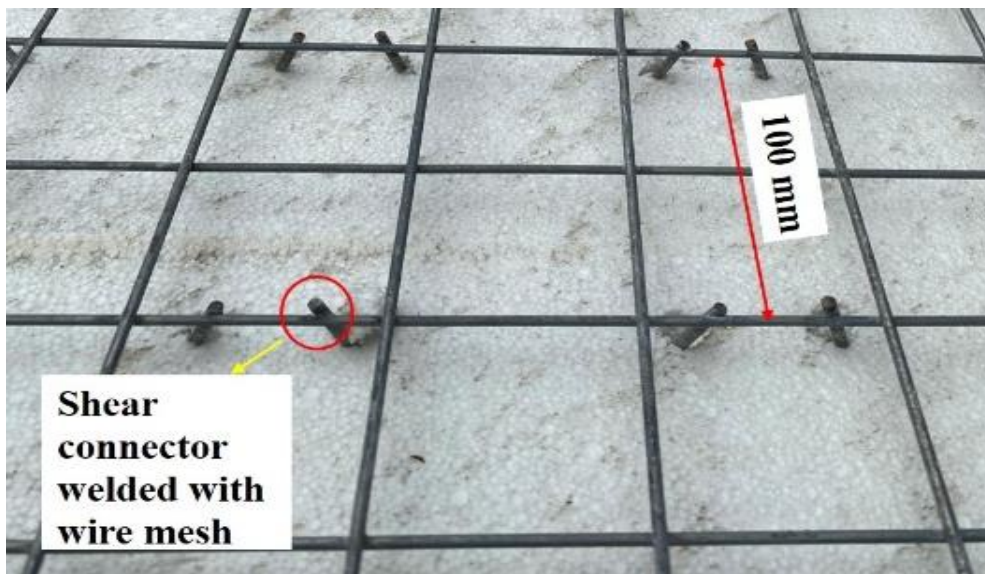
19: Magnified view of welded wire mesh and shear connector
